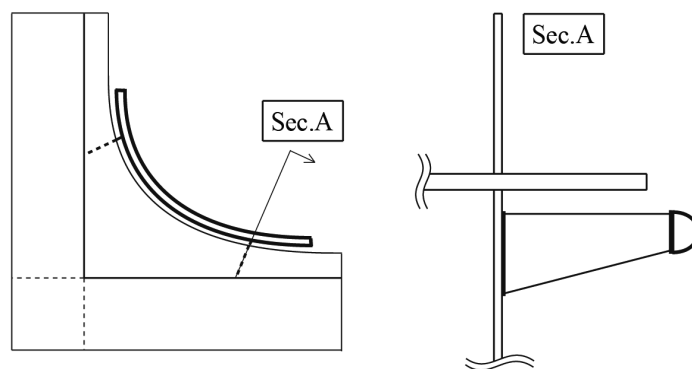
Example of the Method for Providing Slant Plates
